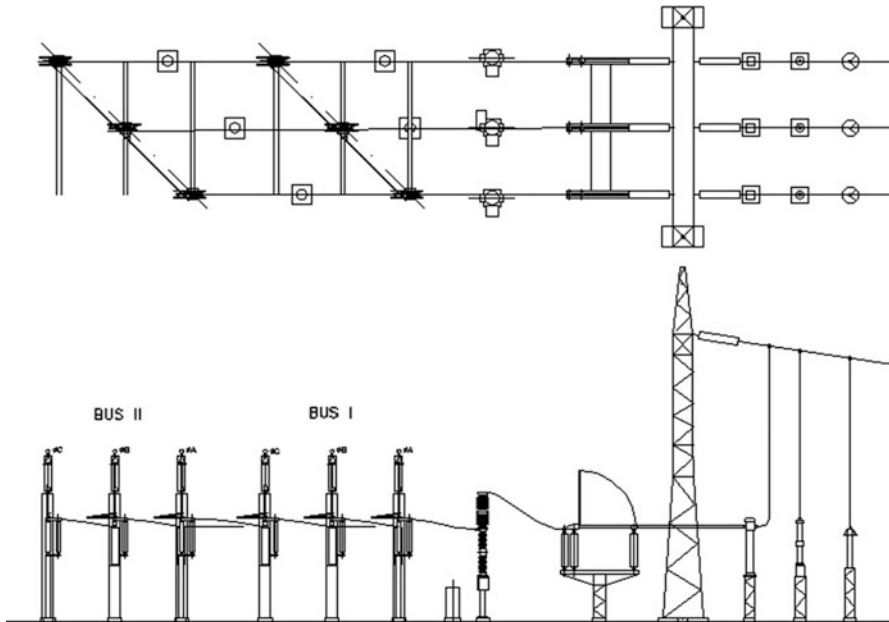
Busbar with rigid conductors: plan and elevation drawings (Carlos 1991)
